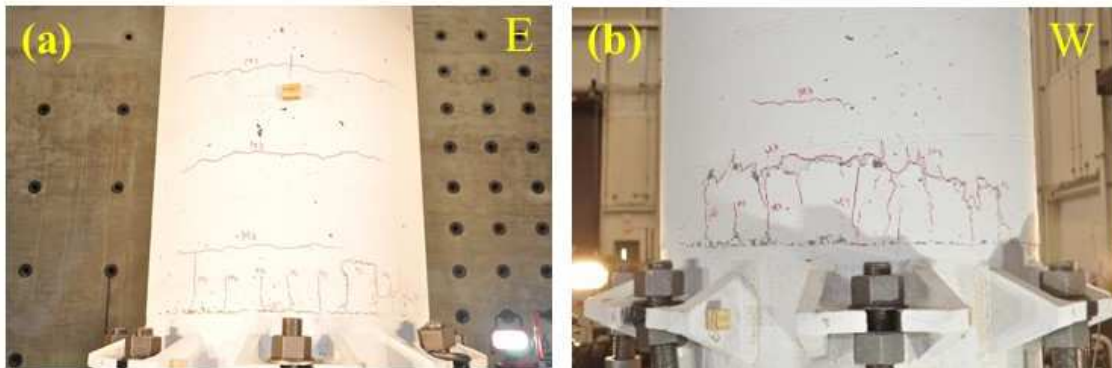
Cracks in concrete in PUED rocking column at $1.8 \times DE$: (a) east side; (b) west side.
